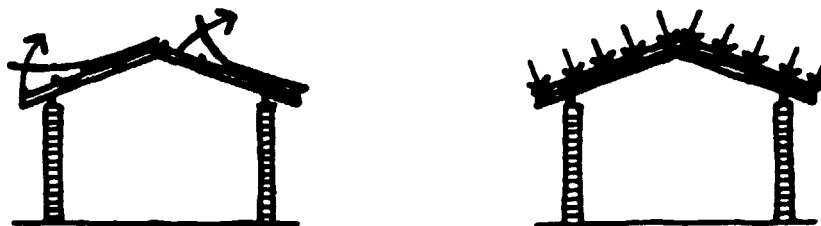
Roof sheeting disengagement due to failure of the sheeting/fastener system
